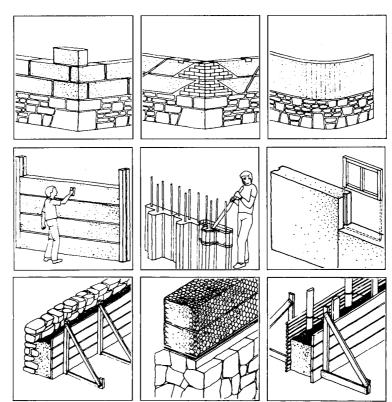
Rammed earth walls can be built in many ways; all can be protected with mud render or plaster.
